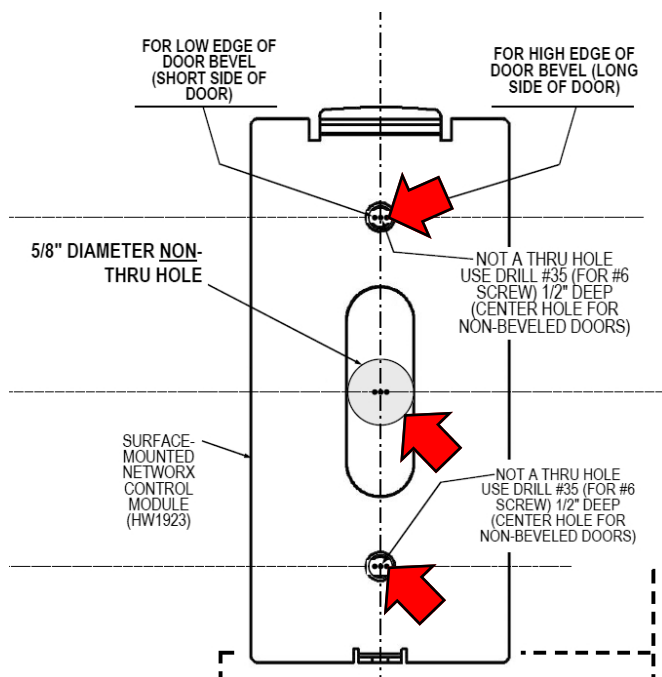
MARK THE THREE "CONTROL UNIT MOUNTING PLATE" HOLES (ARROWS)
